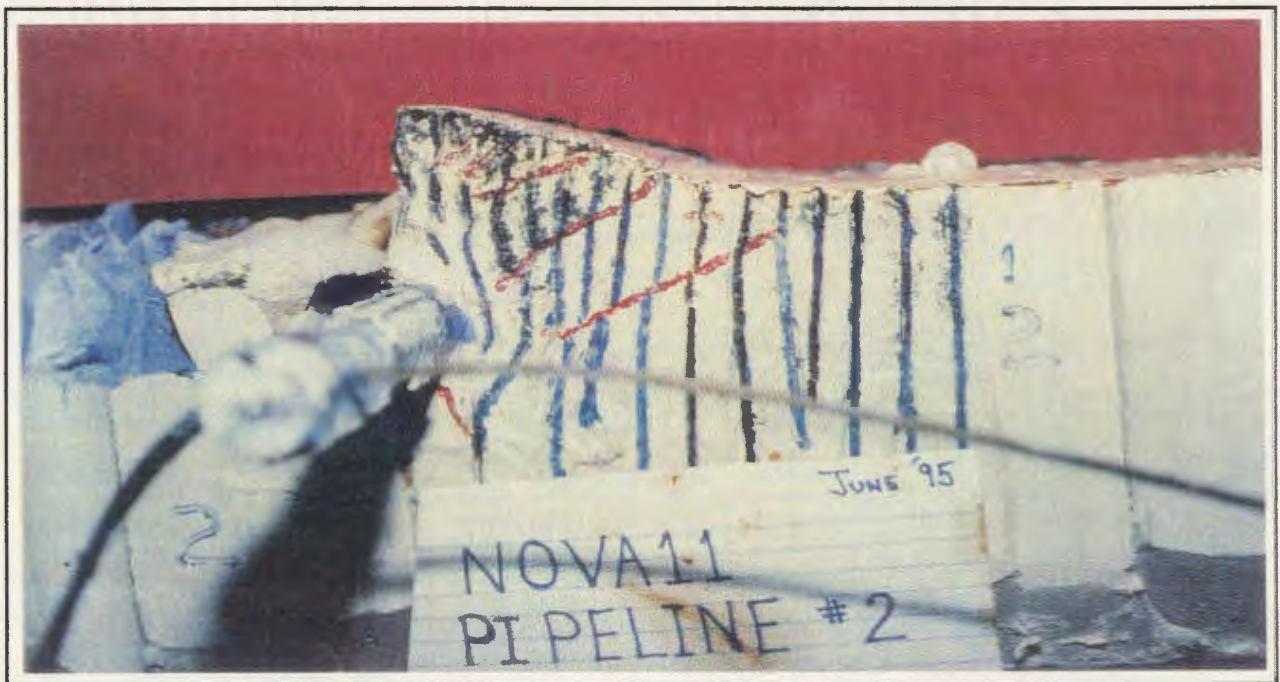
Photo of excavated cross-section along mid length of model pipeline #2, 0.0053mm/sec, Test 07.
